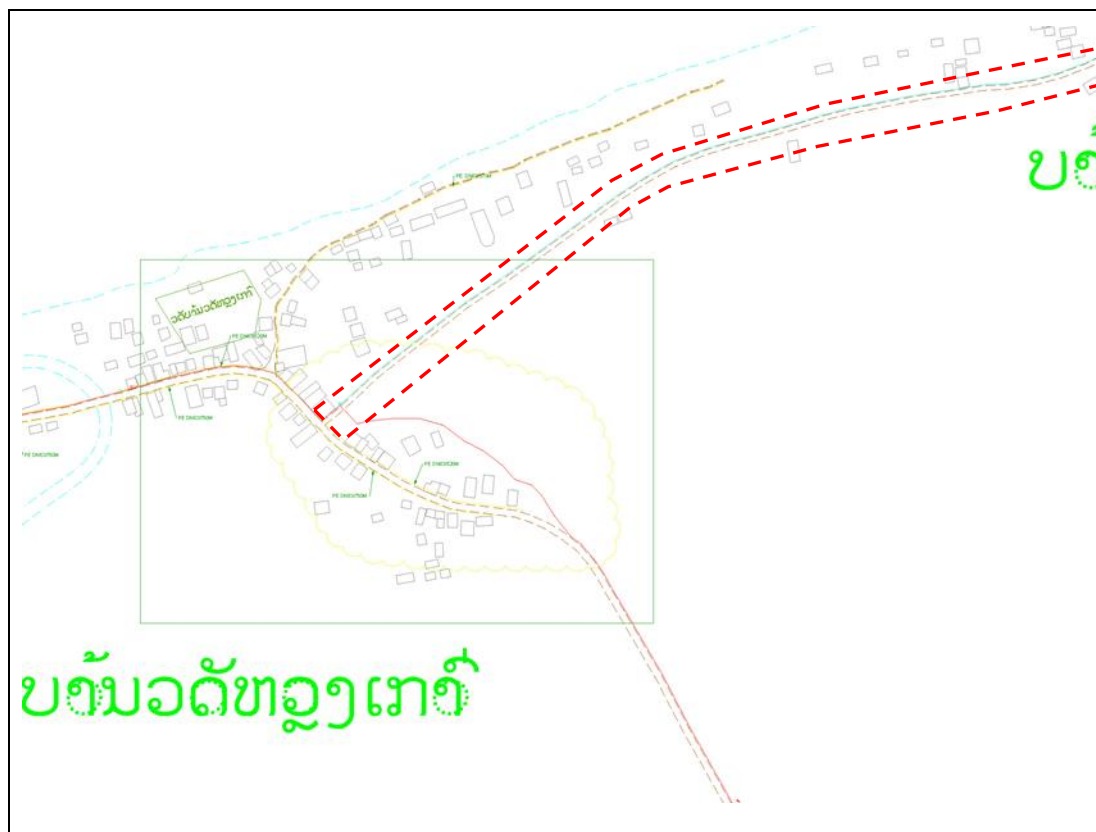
Pipeline installing on the area inner ancient wall and Phanone village.
